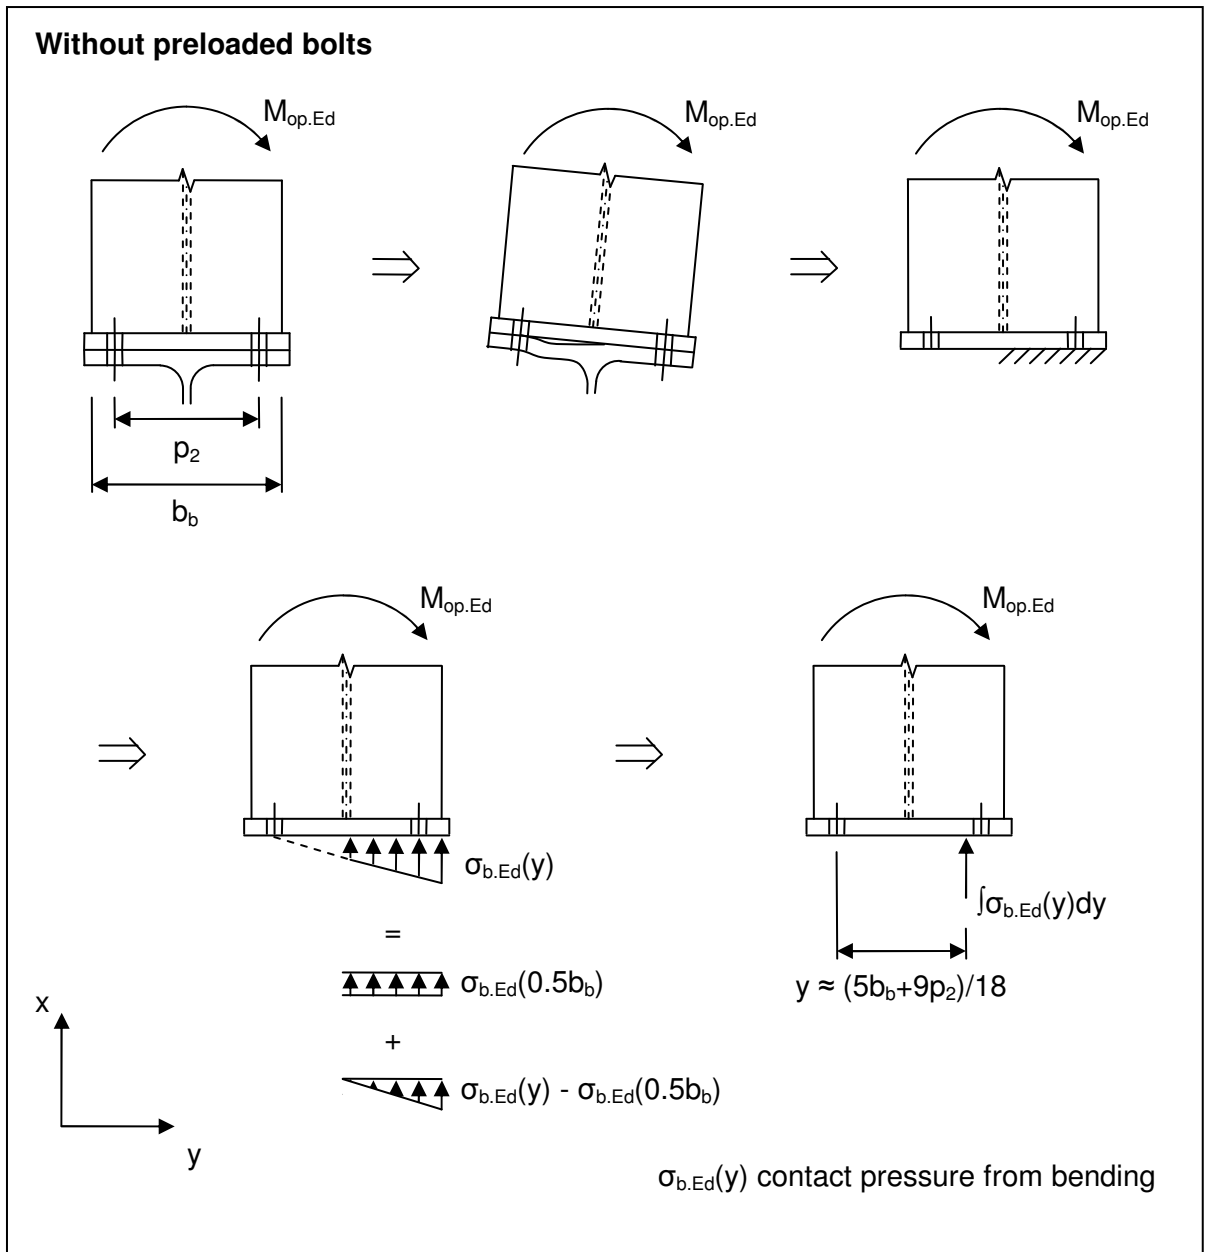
Centre of compression for out-of-plane bending, bolt-lines inside beam – low stiffness in column flange relative to bolts²
